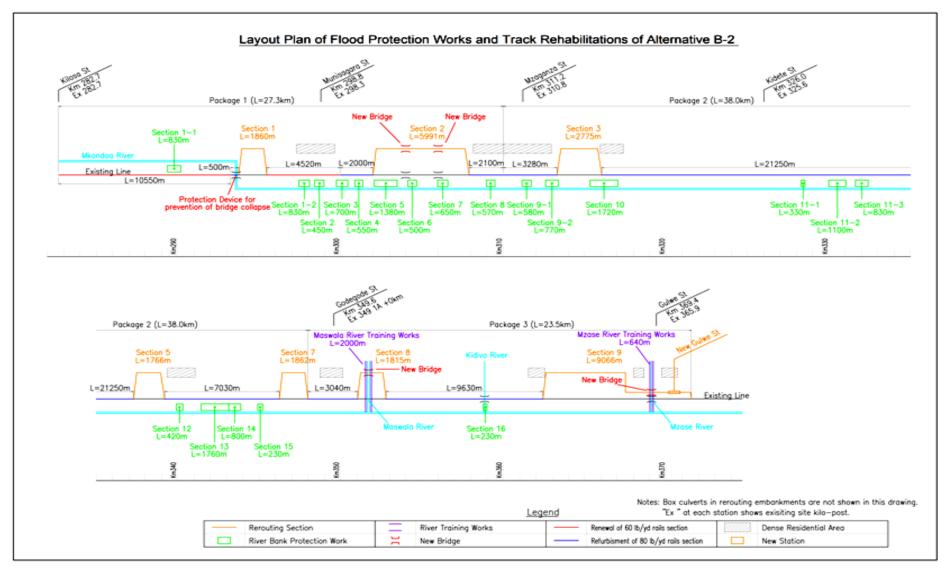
Layout plan of flood protection works and track rehabilitation of alternative B-2
